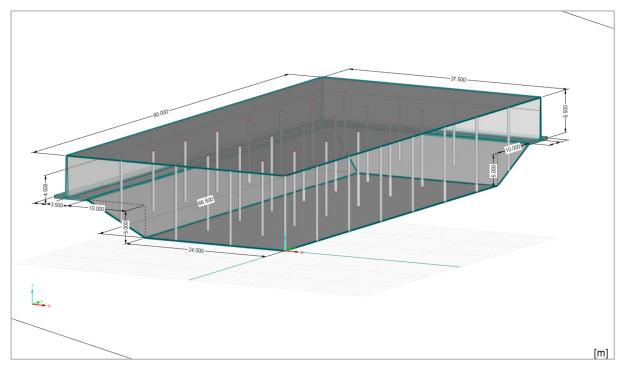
Type 3 - Example of Earth fill embankment type or hopper bottom reservoir
